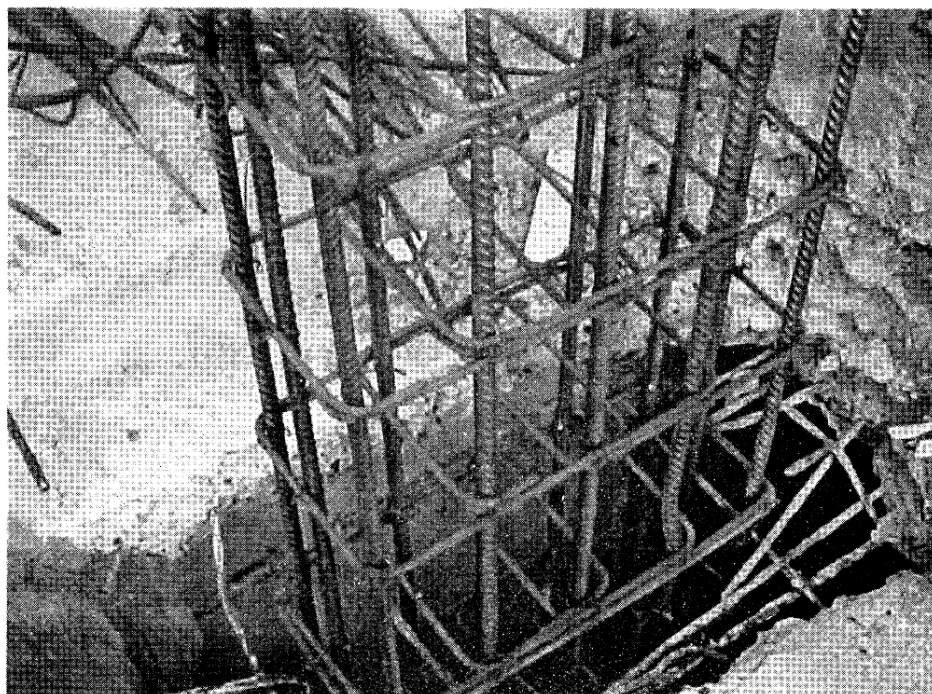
Use of 90° hooks for the transverse reinforcement.
